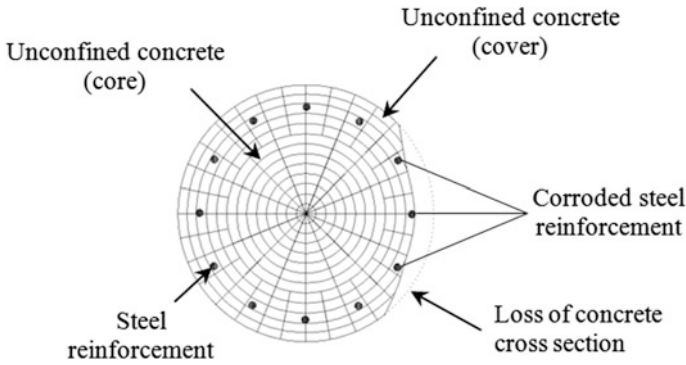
Fiber section model in *OpenSees*: the damaged base column section due to corrosion phenomena
